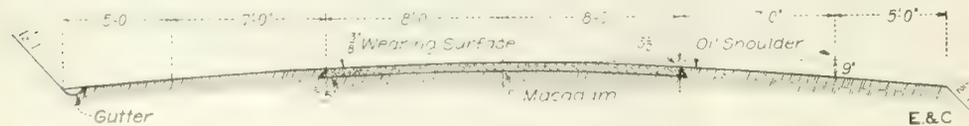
Cross Section of Foothill Boulevard, Los Angeles County, California.
